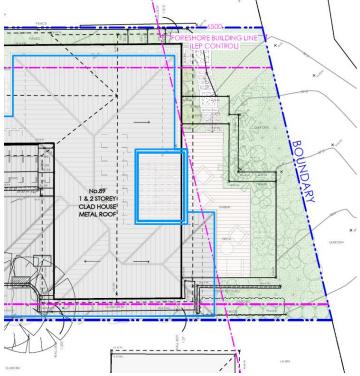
Plan noting amended proposed works in blue and existing dwelling footprint in black outline
